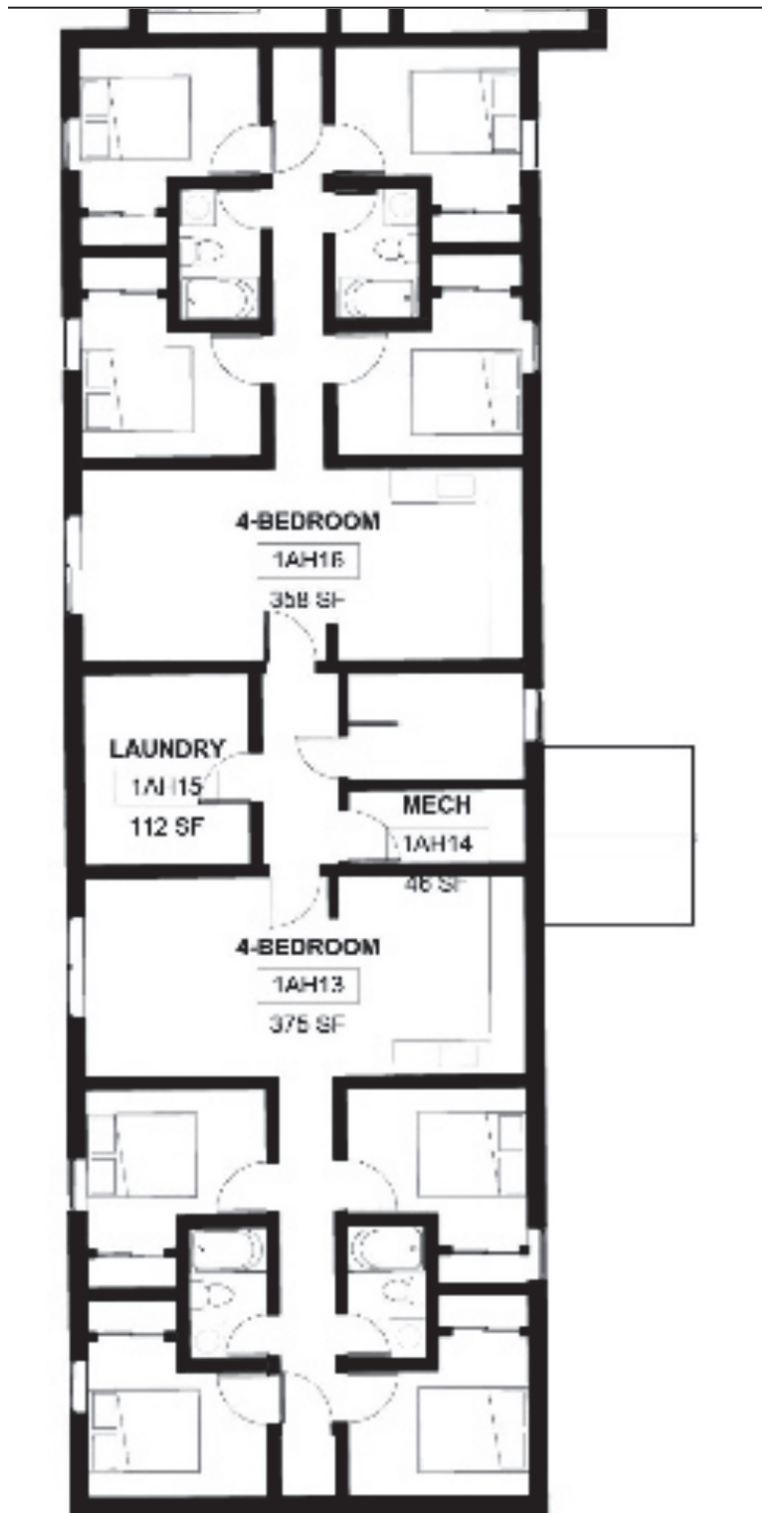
Affordable Housing Apartment Units Level 2 Floor Plan
